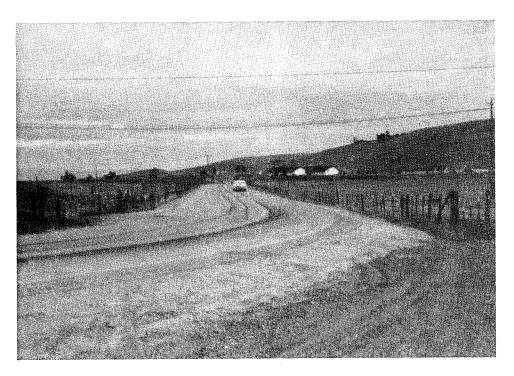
View of RCC roadway from curve looking toward sta 0+00
